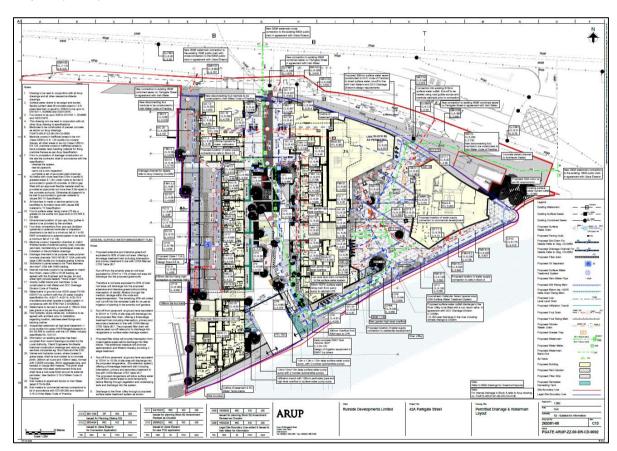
Extract from Surface Water Management Plan depicting permitted drainage and watermain layout (Source: ARUP, 2024)
